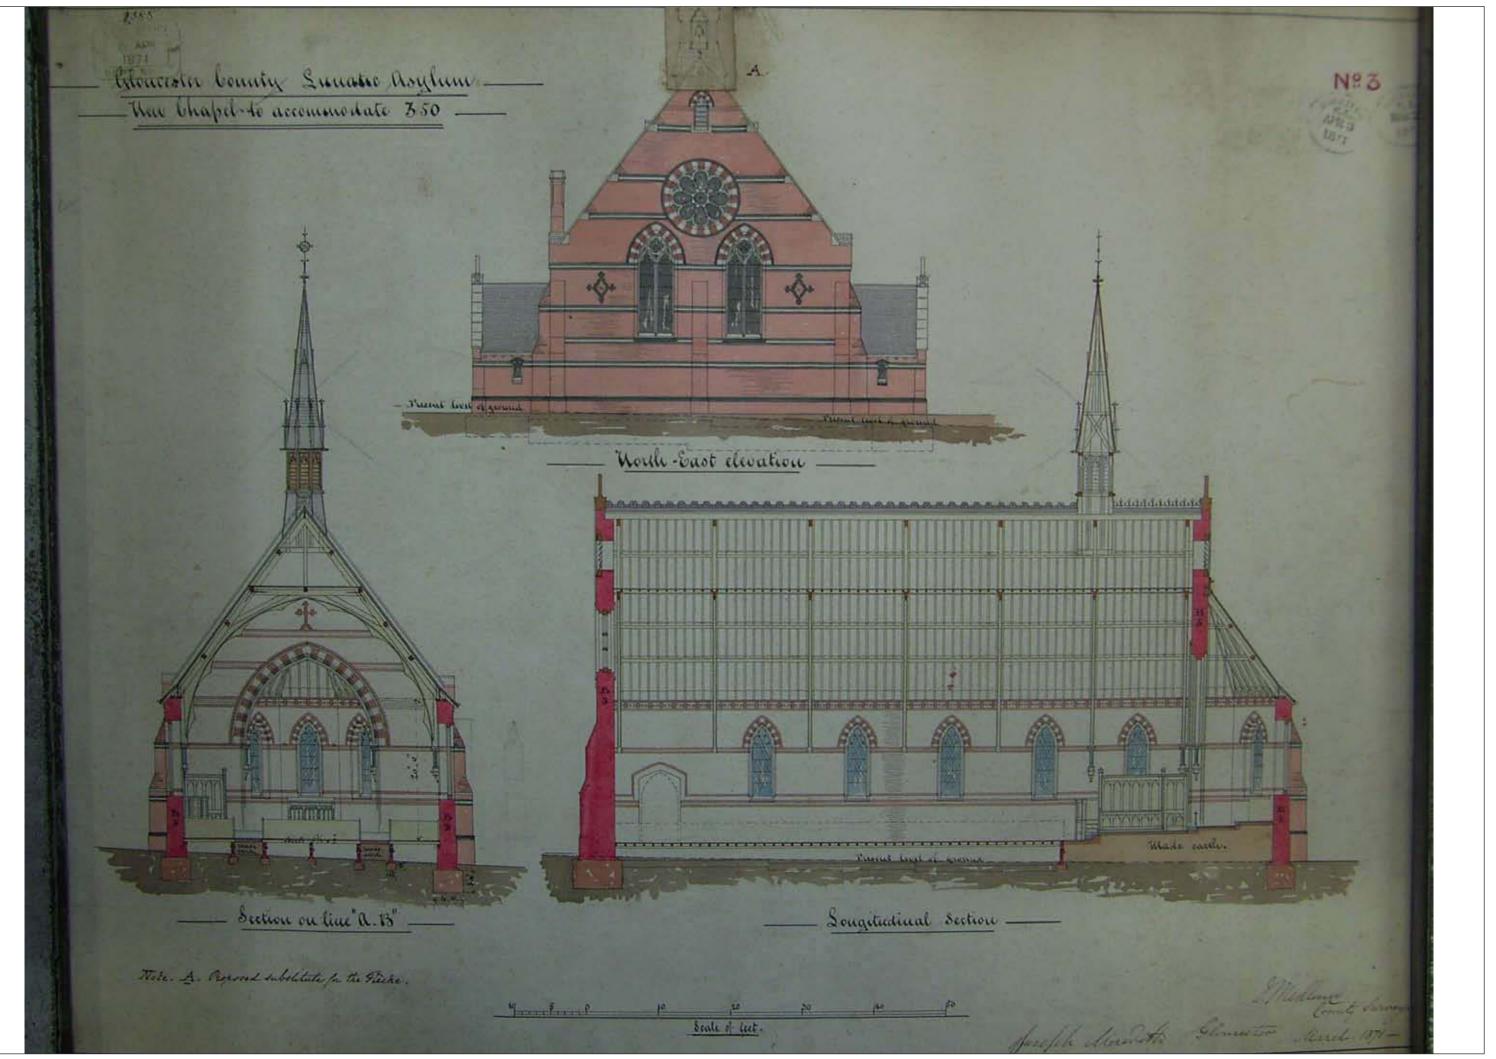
Elevations and sections of the chapel 1871 with footing and made earth details. Reproduced by kind permission of Gloucestershire Record Office (GRO Q/AL/25a/3-5)
